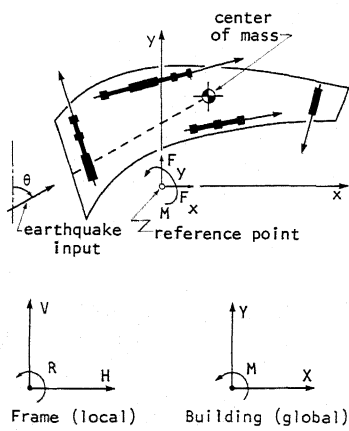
Plan View of a Typical Building (from Ref. 2)
